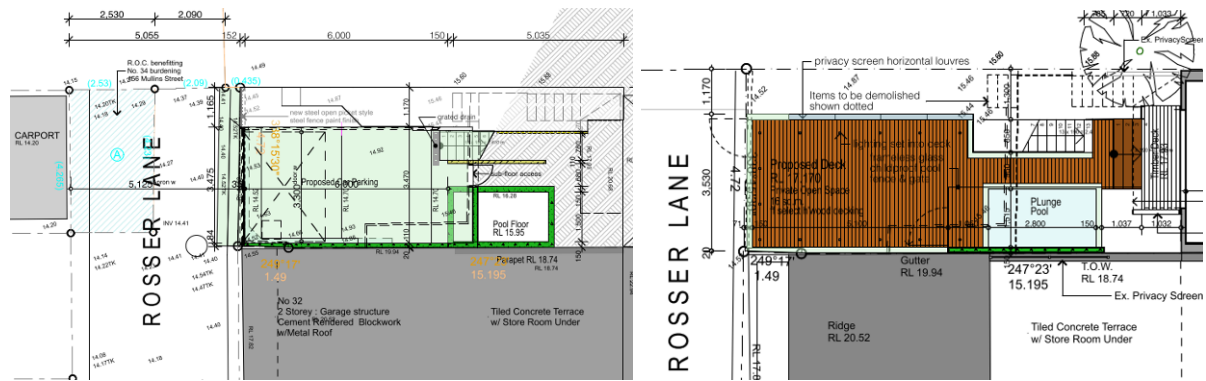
Proposed carport and deck plan at 34 Rosser Street Rozelle.
